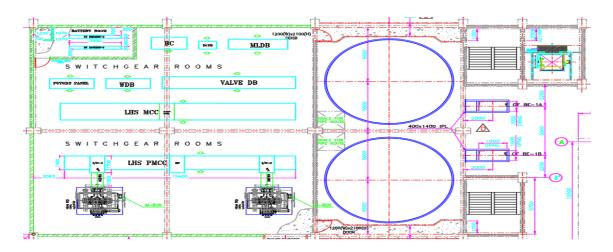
Plan layout of EL (+) 9.7m Switchgear room
